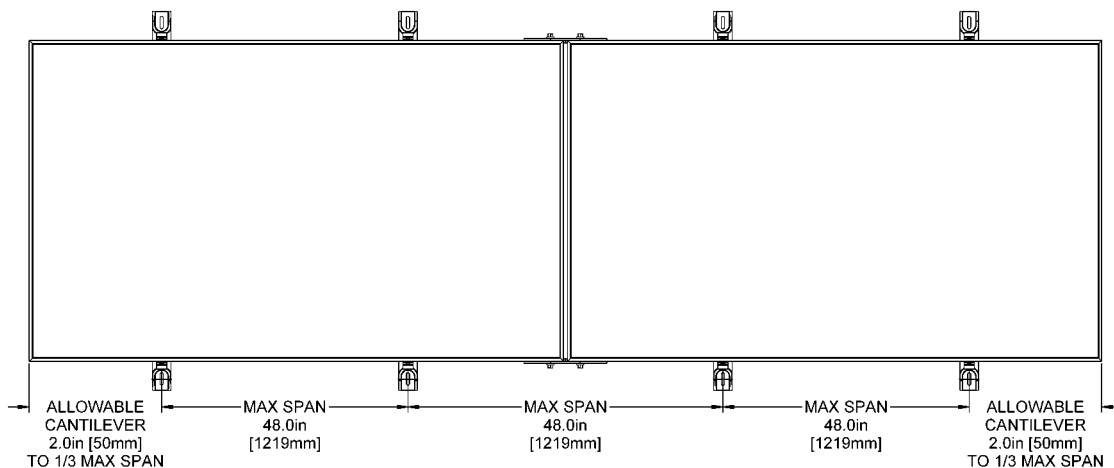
Layout With Leveling Feet, Portrait Example, 50 psf (2400 Pa) Design Load
